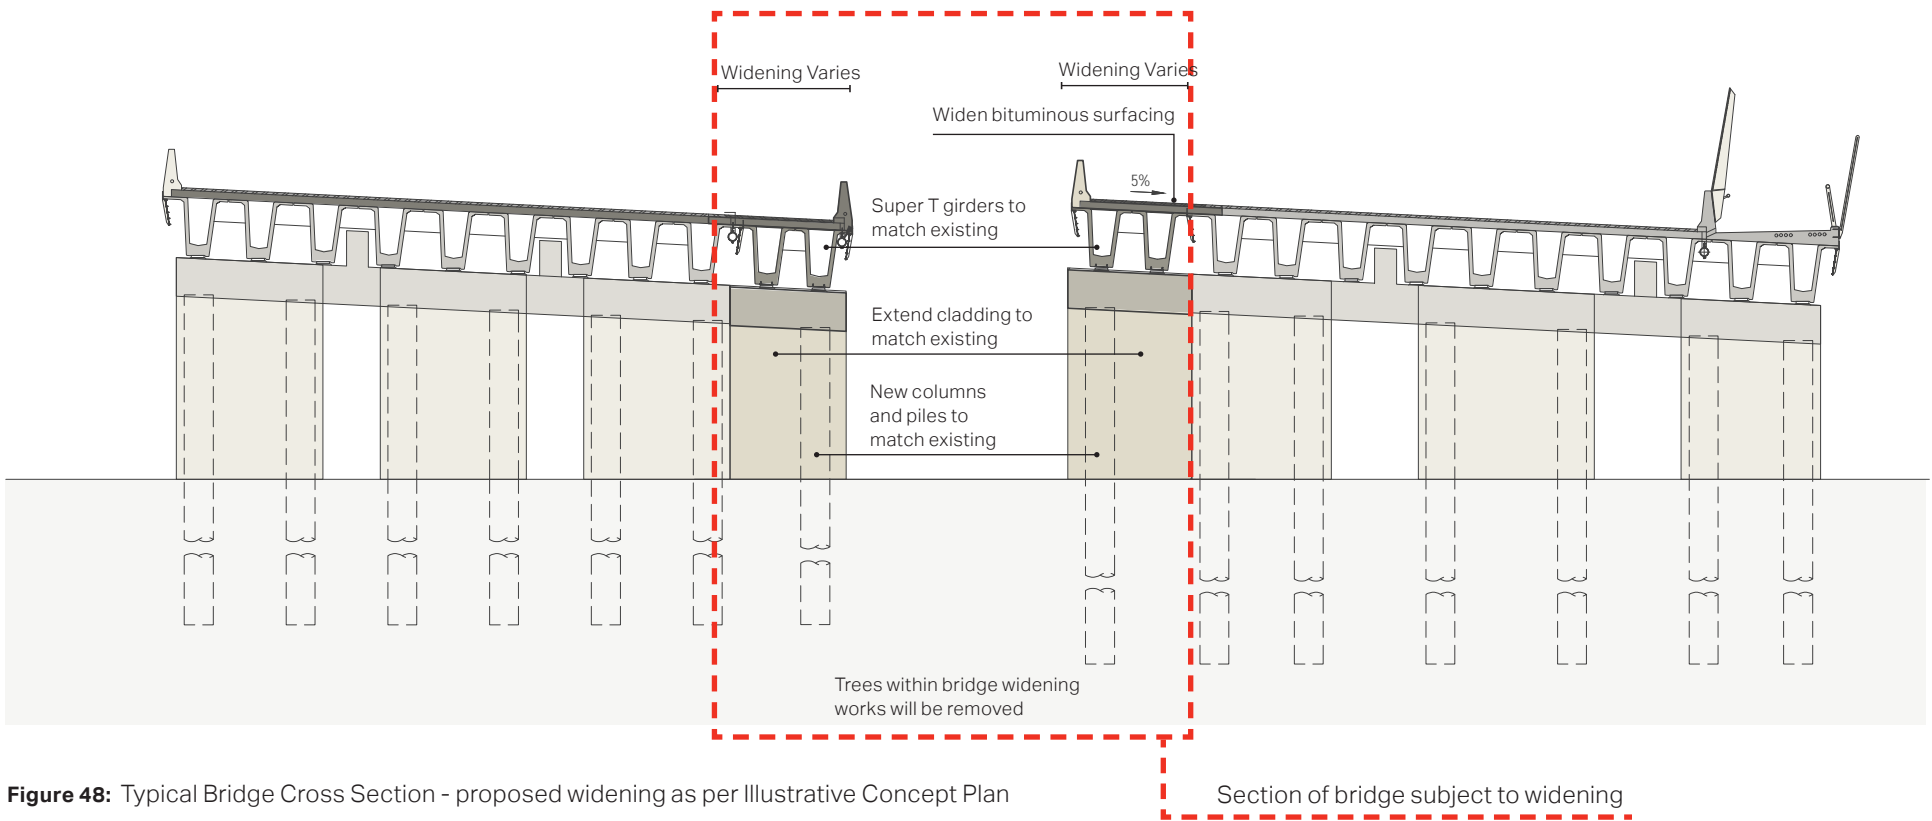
Typical Bridge Cross Section - proposed widening as per Illustrative Concept Plan
